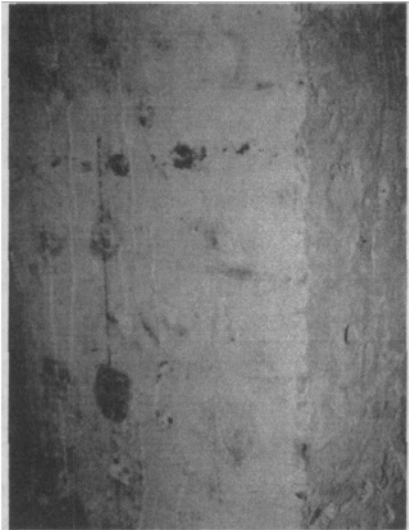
The standard floor column cracks of Neimeng Hotel
